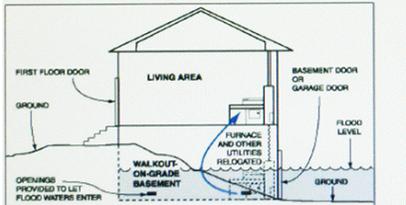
A structure with a wet floodproofed walkout-on-grade basement
